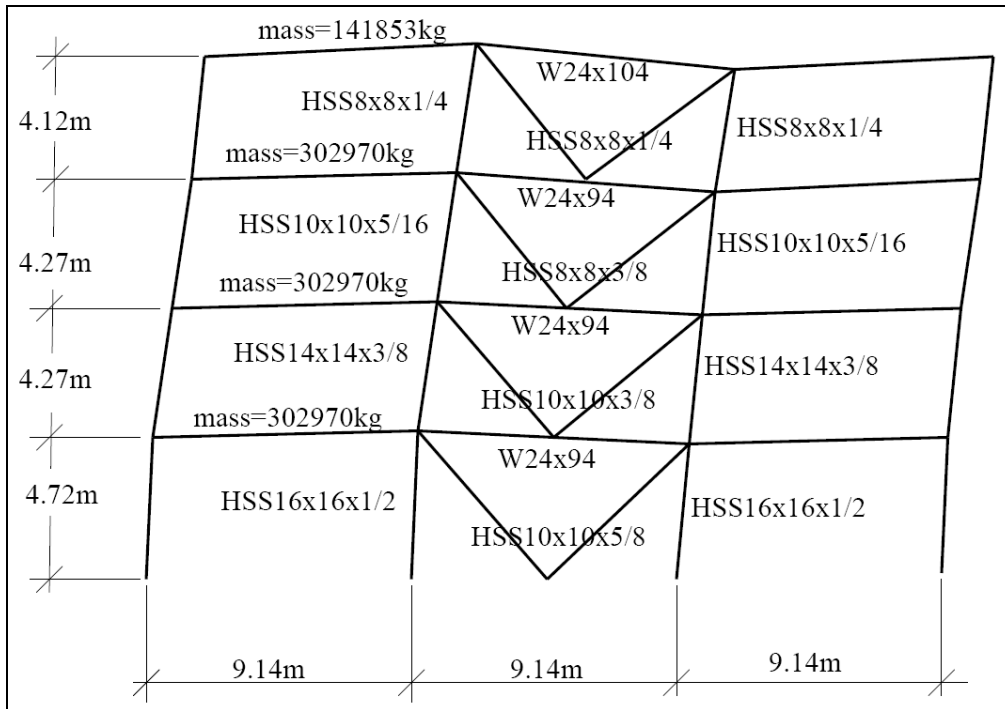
Undamped Model for Rooftop Tuned Frame Study^{10,11}
